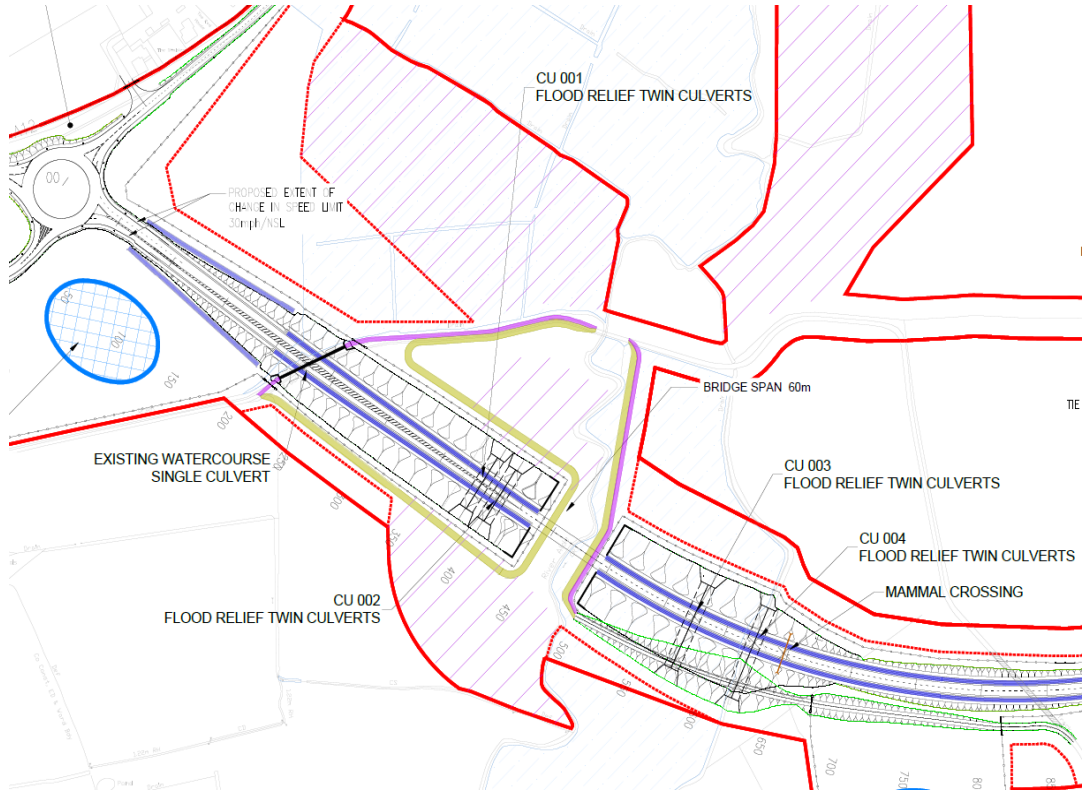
Extract from SZC Co. two village bypass drawing: SZC-SZ0204-XX-00-DRW-100297 – Location Plan: showing how piers avoid the river channel
